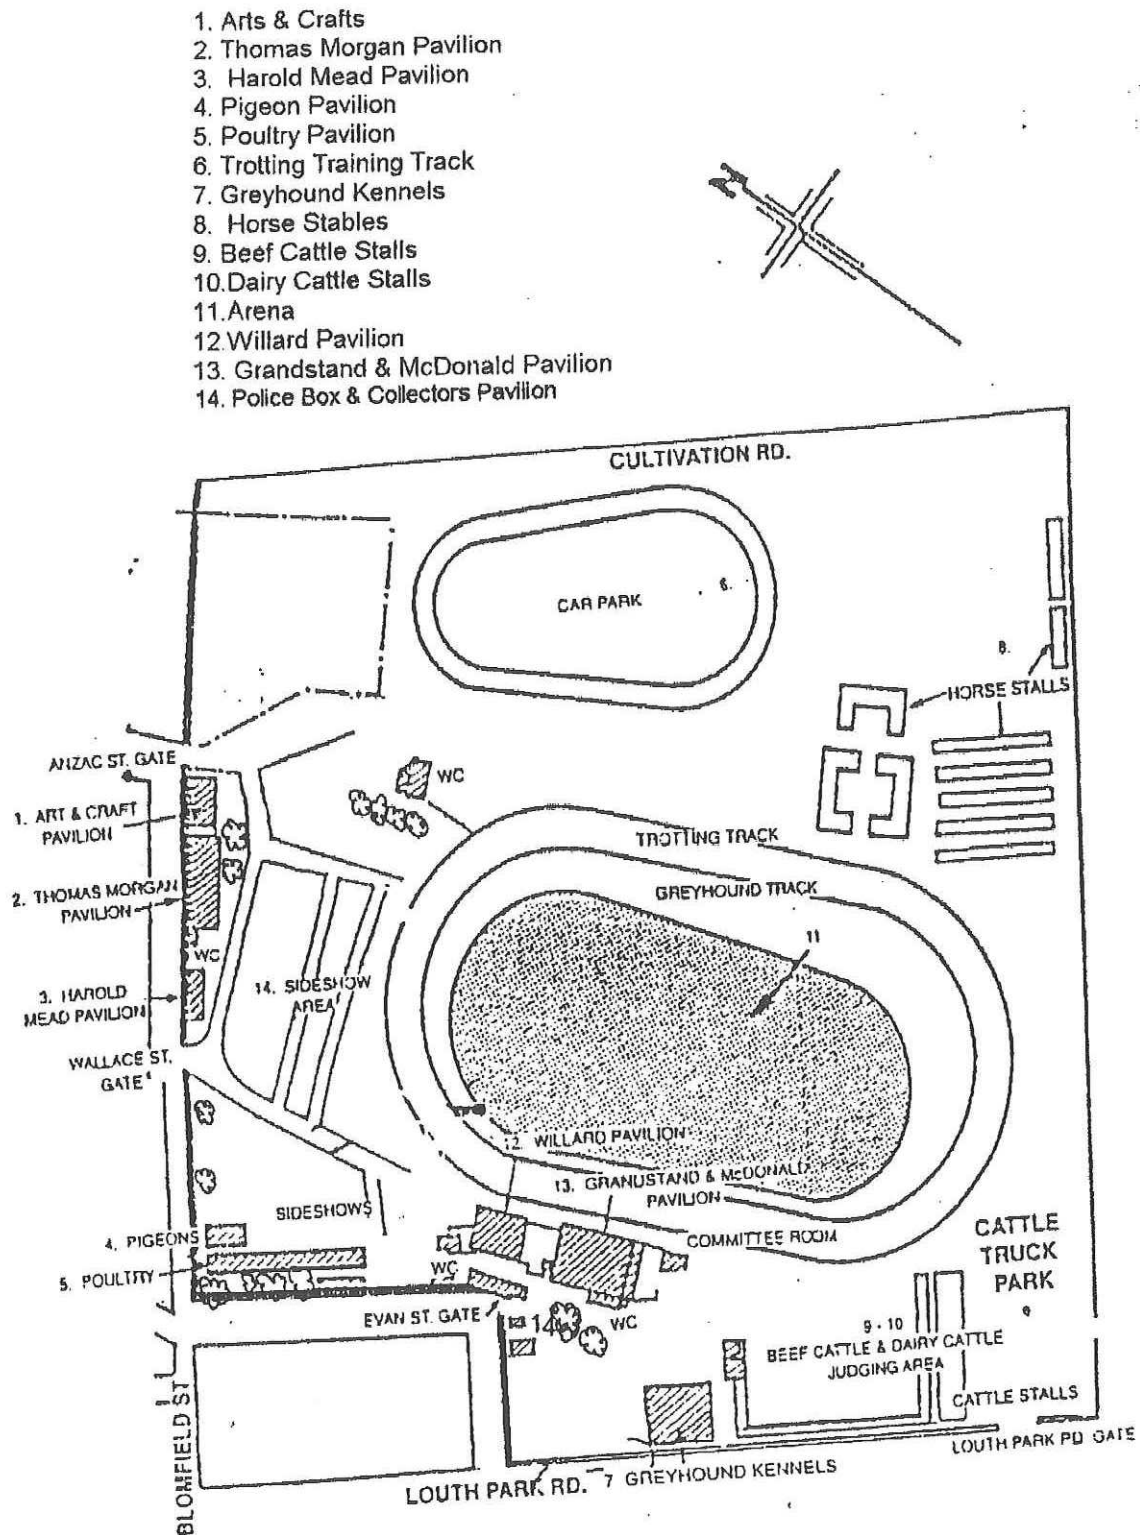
PLAN OF MAITLAND SHOWGROUND
